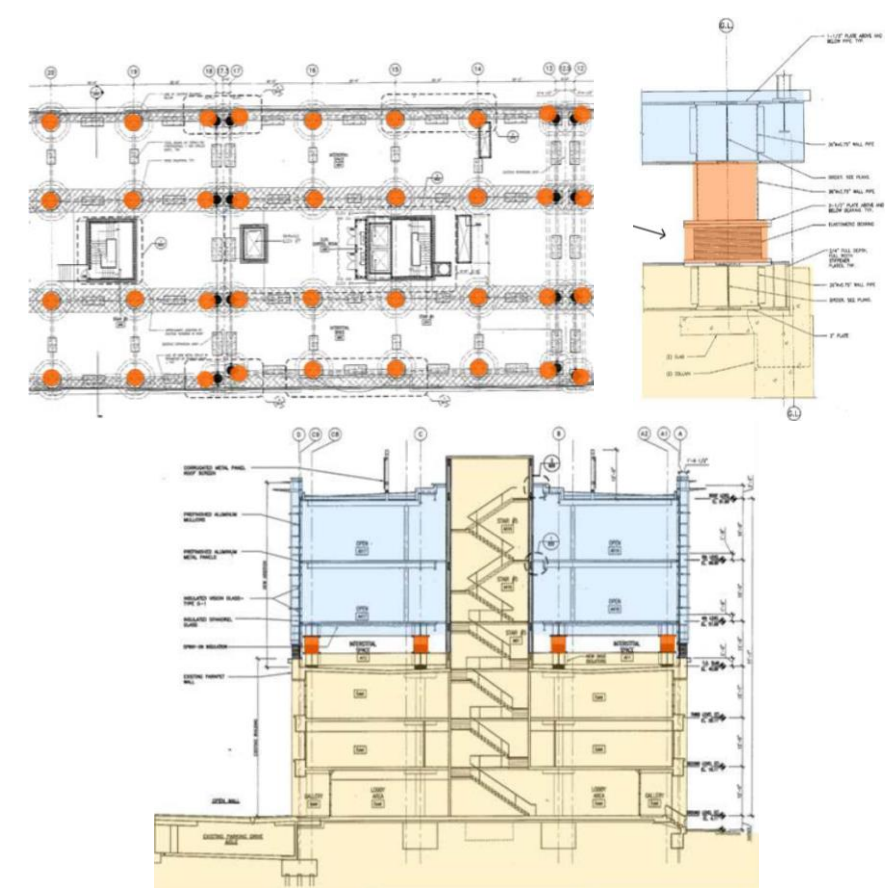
(a) Seismic isolation plan, (b) detail of the elastomeric bearing, (c) Cross-section of the building
